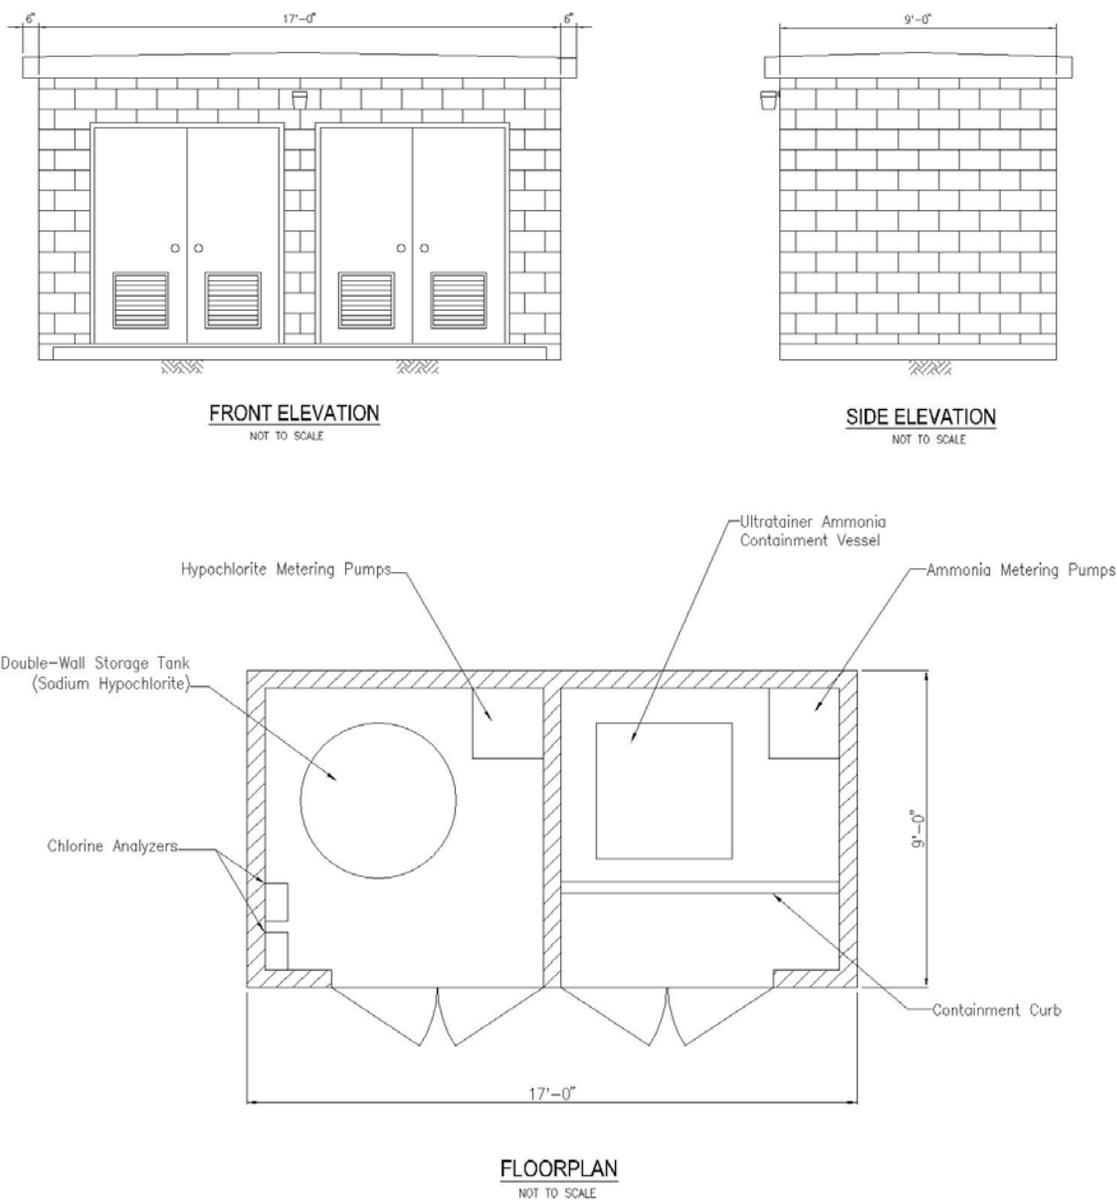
Proposed Chloramination Building Layout (Sundale)
